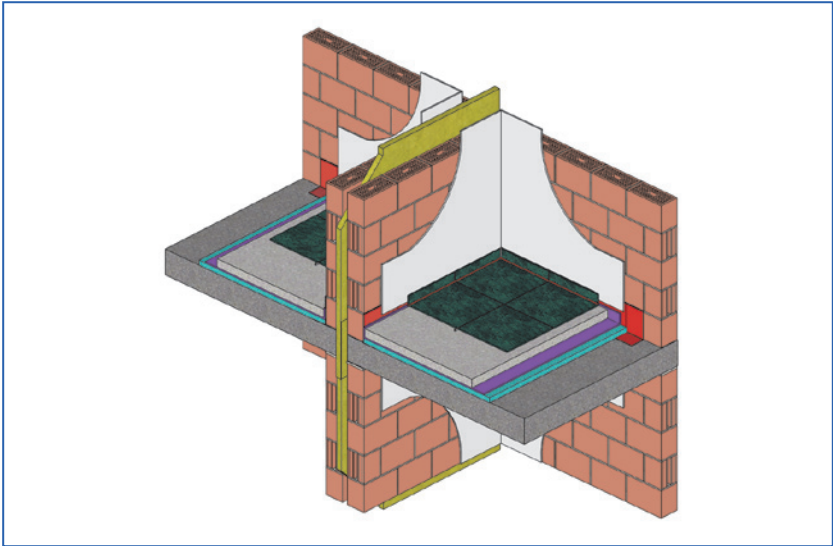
Building concept 2 uses semi-heavy walls ($> 125 \text{ kg/m}^2$) and needs very heavy concrete slabs ($> 550 \text{ kg/m}^2$) if used for apartment constructions.
